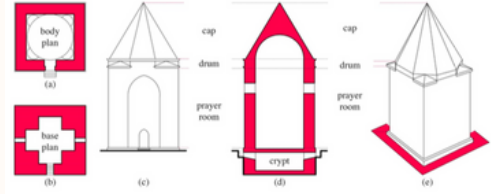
Kumbet of Melik Gazi in Kayseri. a Base plan, b body plan, c elevation, d section and main components, e axonometric view and main components. Image: authors based on Özgüç and Akok 1954
